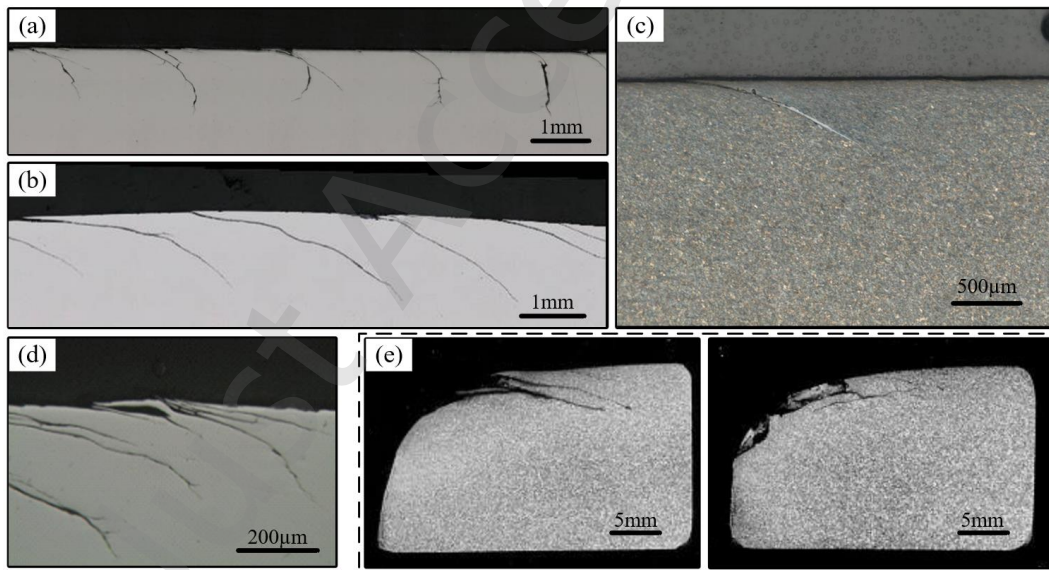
Typical RCF damage in the cross-section of rails: (a) tread cracks in single-track rails; (b) gauge corner cracks in severely side-worn rails [10]; (c) gauge corner cracks in rails without side wear; (d) gauge corner cracks in heavy-duty rails [11]; (e) Gauge corner cracks with peeling damage [12].
